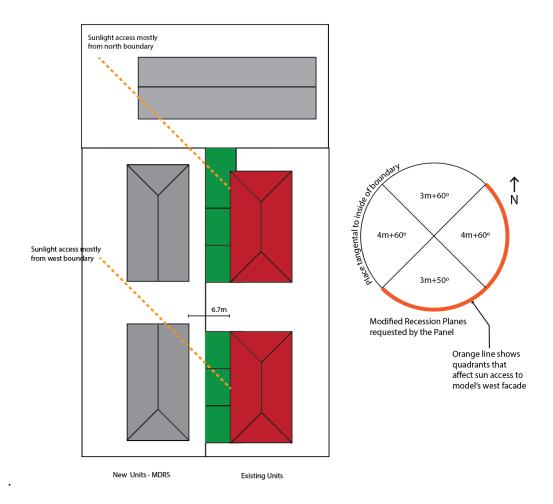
The direct sunlight access at the west façade is determined by the south and east recession planes.
